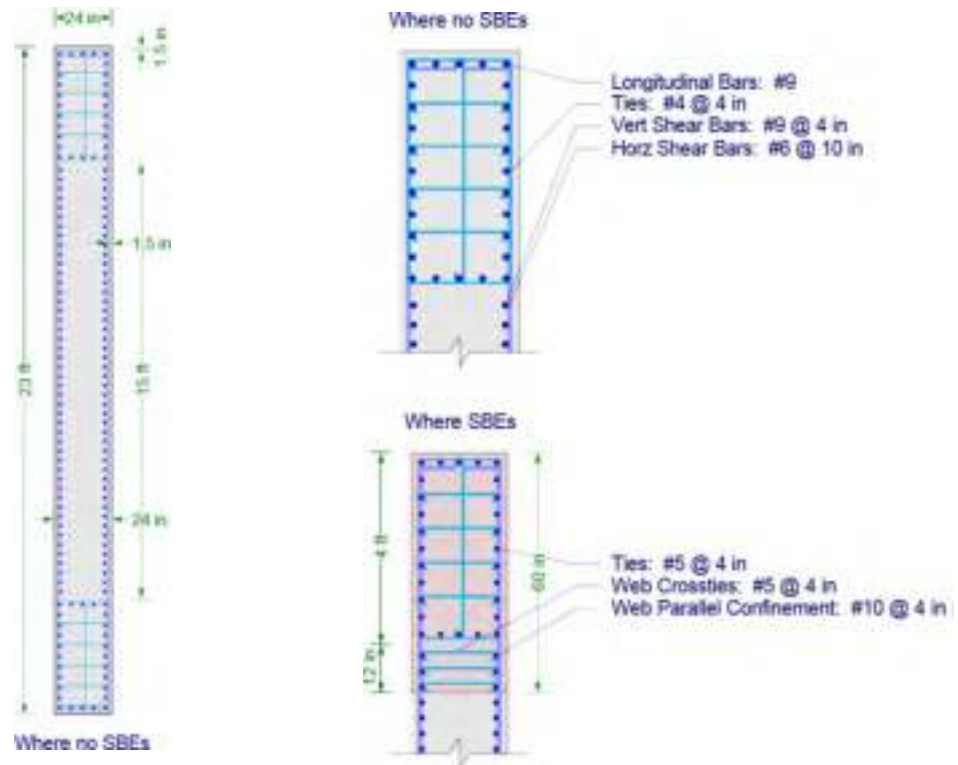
Building (B9-12S-H-S) Special RC Shear Reinforcement Details; Wall Section for Floors 1-3
